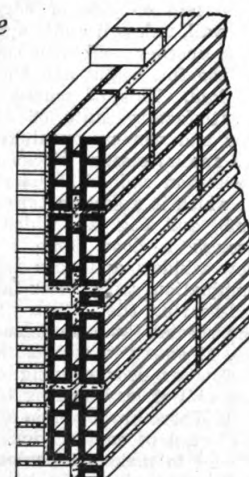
Face brick can be bonded in every ninth course in connection with hollow tile, as shown.
